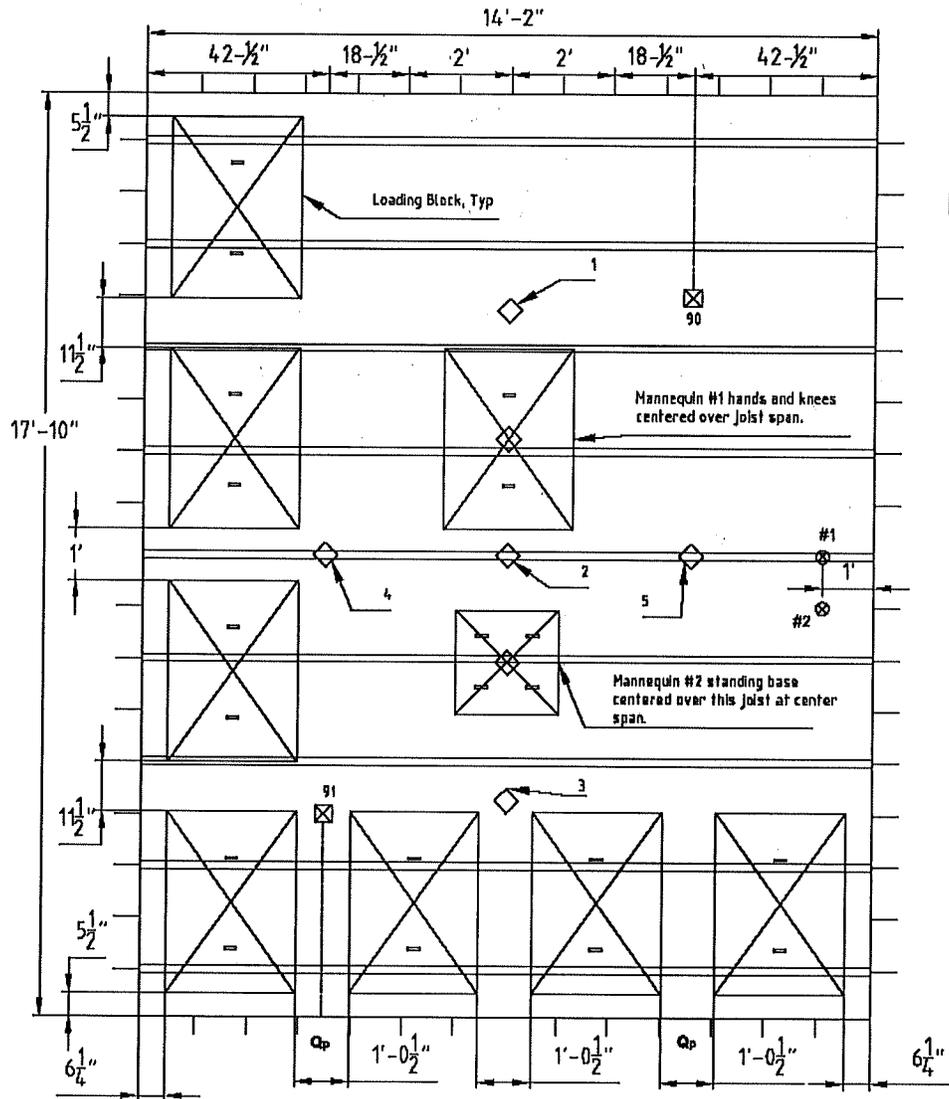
Loading and Instrumentation Layout (See Figure A.2.8).
